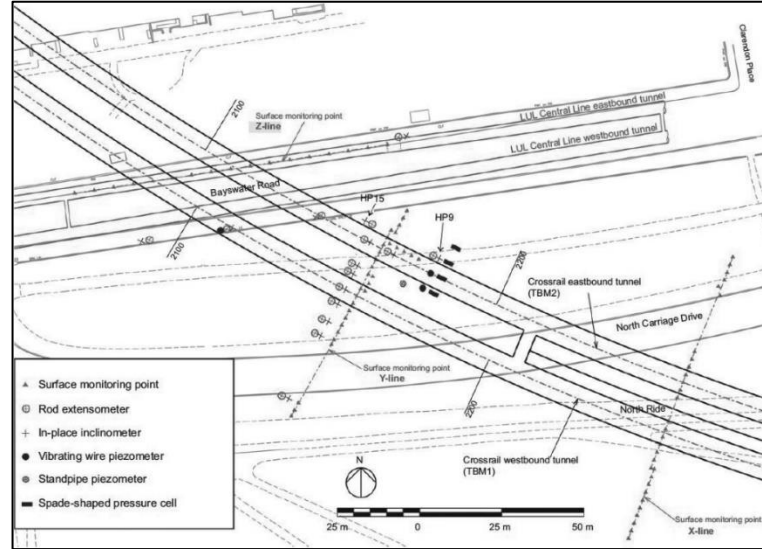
Instrumentation plan at Hyde Park site (Wan *et al.*, 2017)
